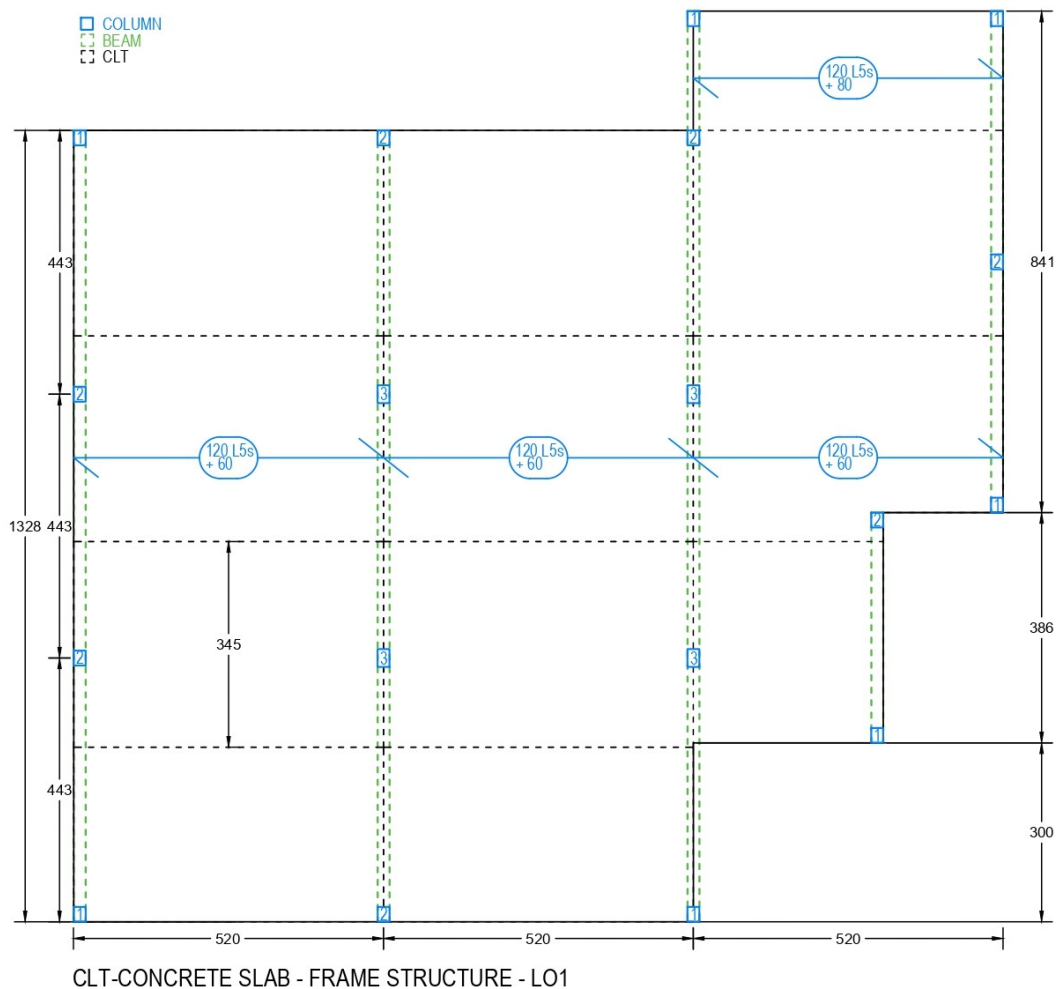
Conceptual structural design plan of the functional unit with CLT-concrete slabs - LO1
